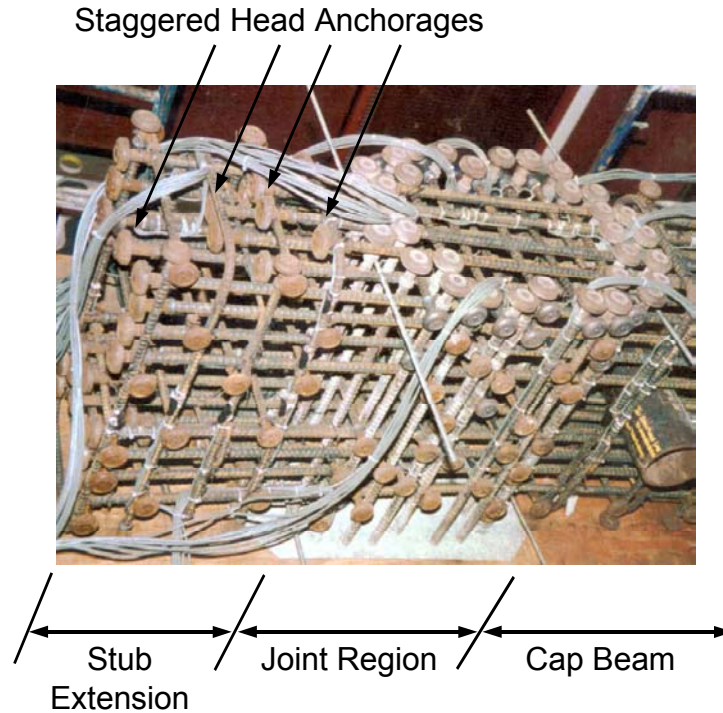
Photo of cap-beam/column joint reinforcement from U.C. San Diego study [58]
